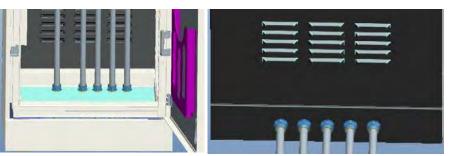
Fastening of oppression ends of the external-oppression type cables
